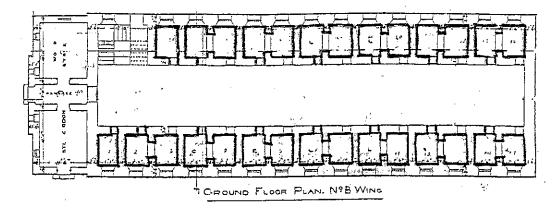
Ground Floor plan of 'B wing'. Diagram is based on a 1925 plan with the modified cell arrangement indicated in bold over the original smaller cell arrangement. (DPW&S Plan Room PC 321/5)
